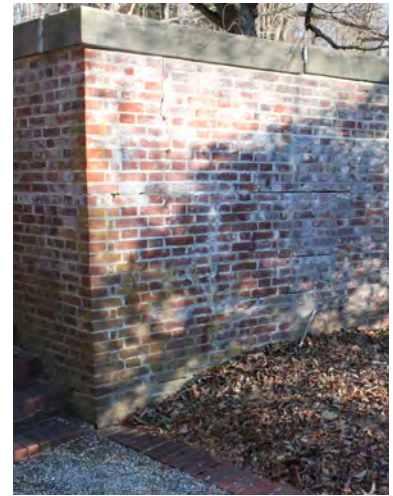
Eroded mortar joints, cracked bricks, and efflorescence at retaining wall. (HA, 2015)
